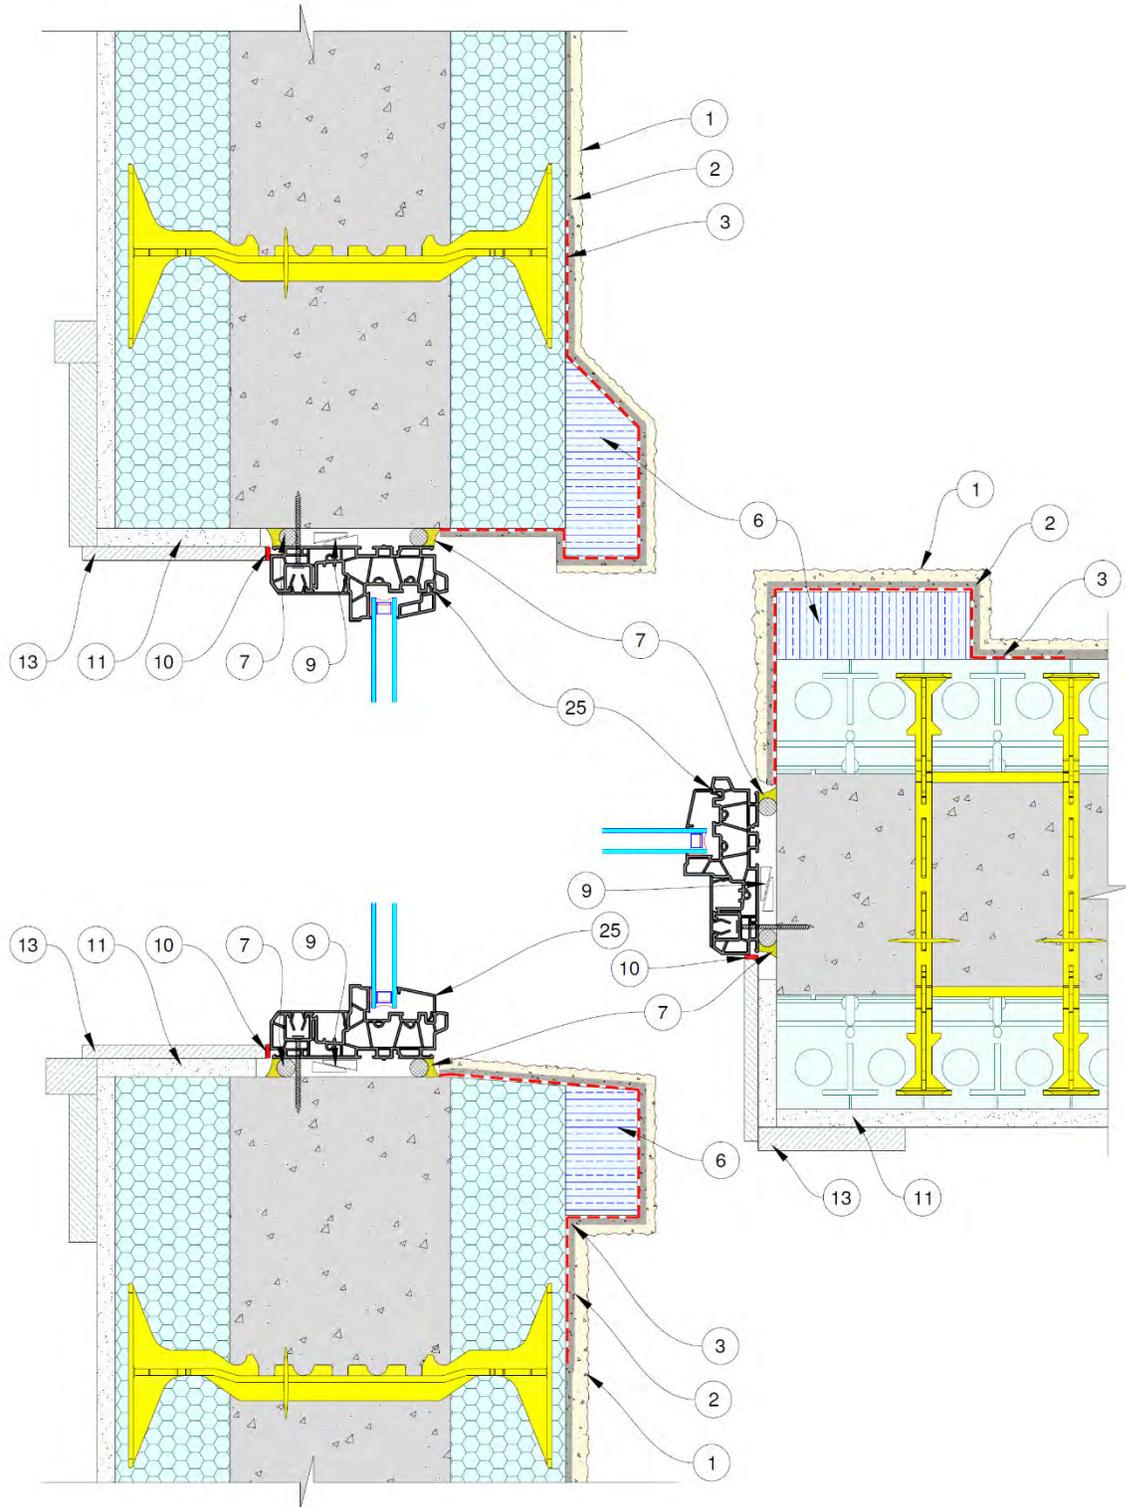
ICF Window Assembly - Direct to concrete, Boxed window centered, EIFS/Stucco lamina
